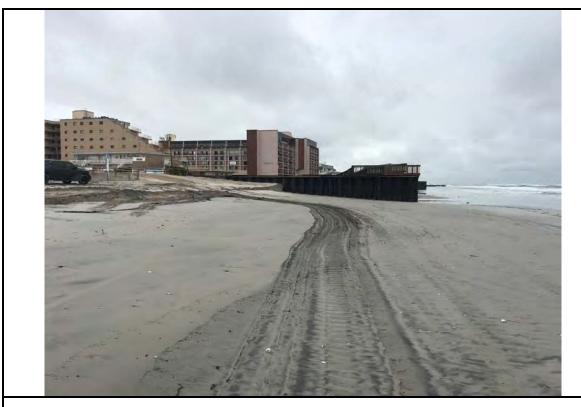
View of steel bulkhead at 8^{th} Avenue looking northeast.
